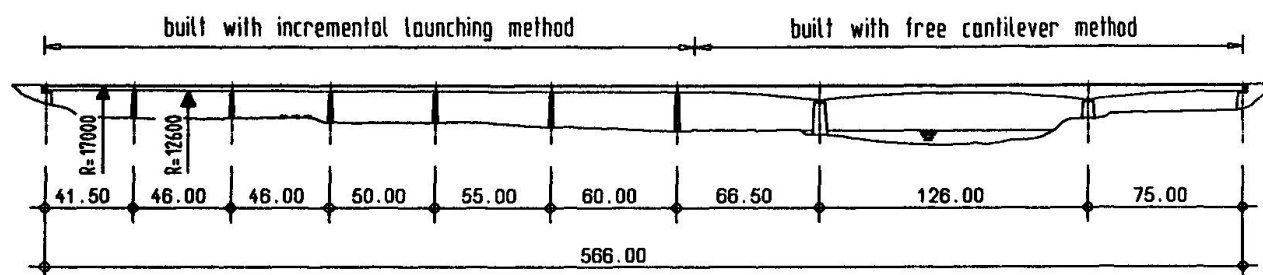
Elevation of structure of Main Bridge Retzbach-Zellingen
